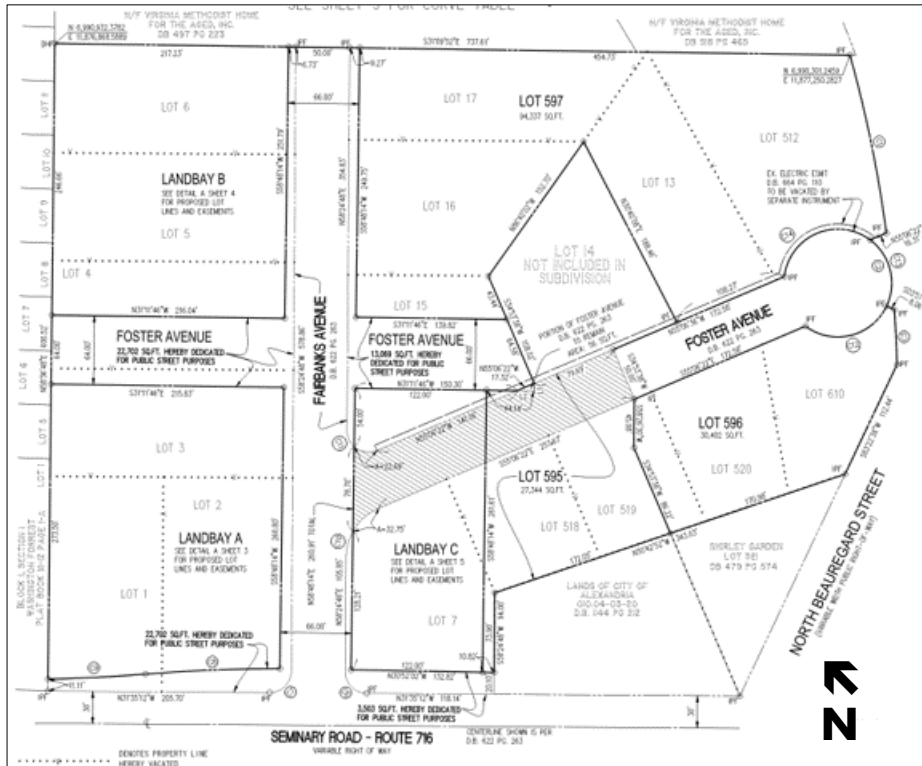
Upland Park Phase 1, resubdivision plan showing realigned and extended Foster Avenue, other street dedications, and parcels.
